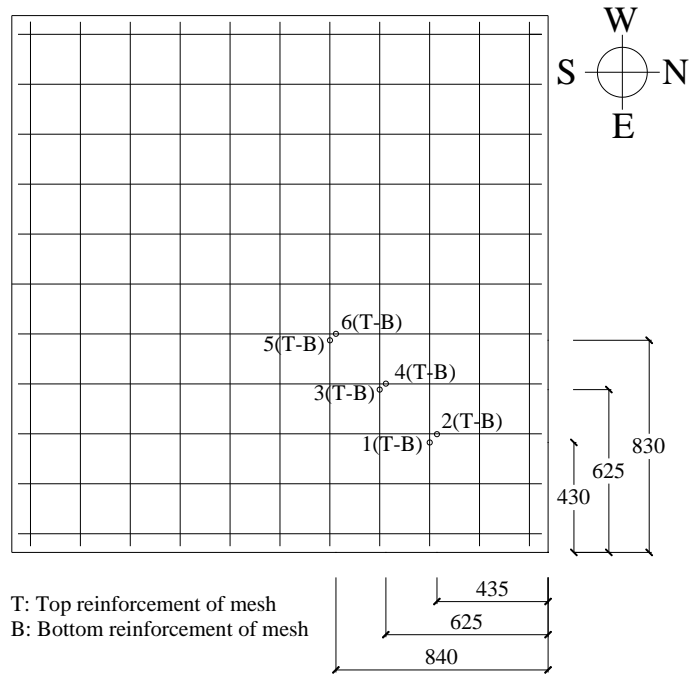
Strain gauge locations for BB200a&b (all dimensions in mm)
